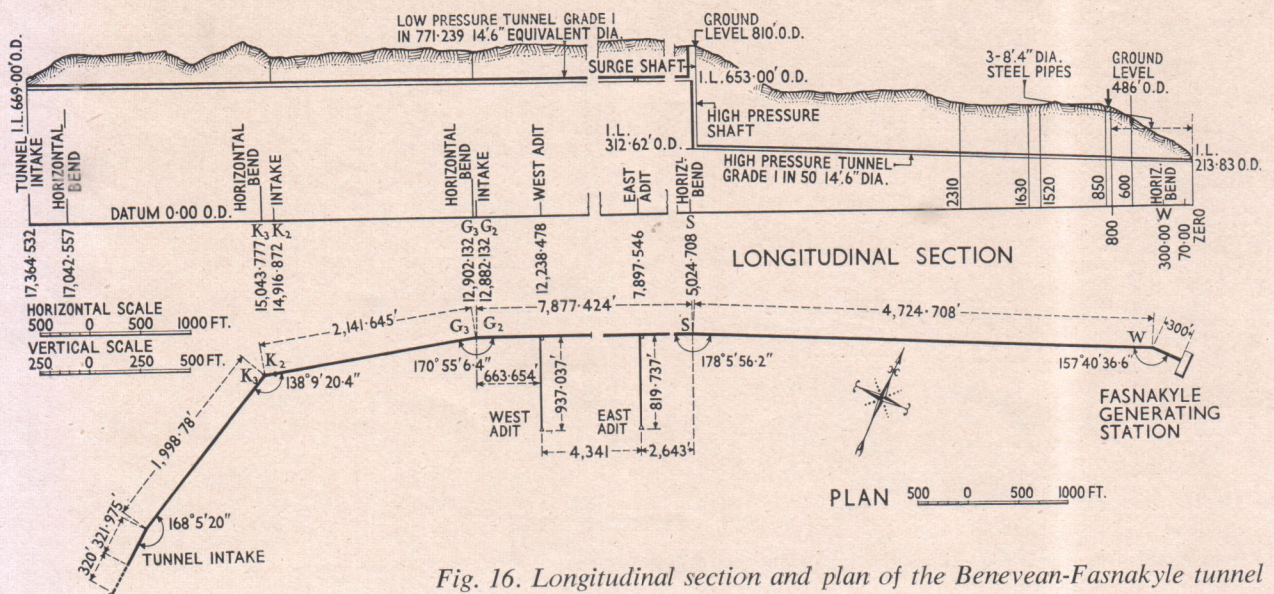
Longitudinal section and plan of the Benevean-Fasnakyle tunnel
